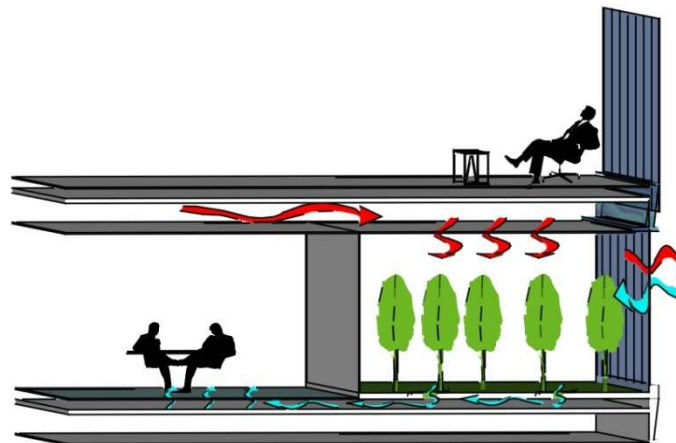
Sketch of the Natural Ventilation in GreenWich Tower
